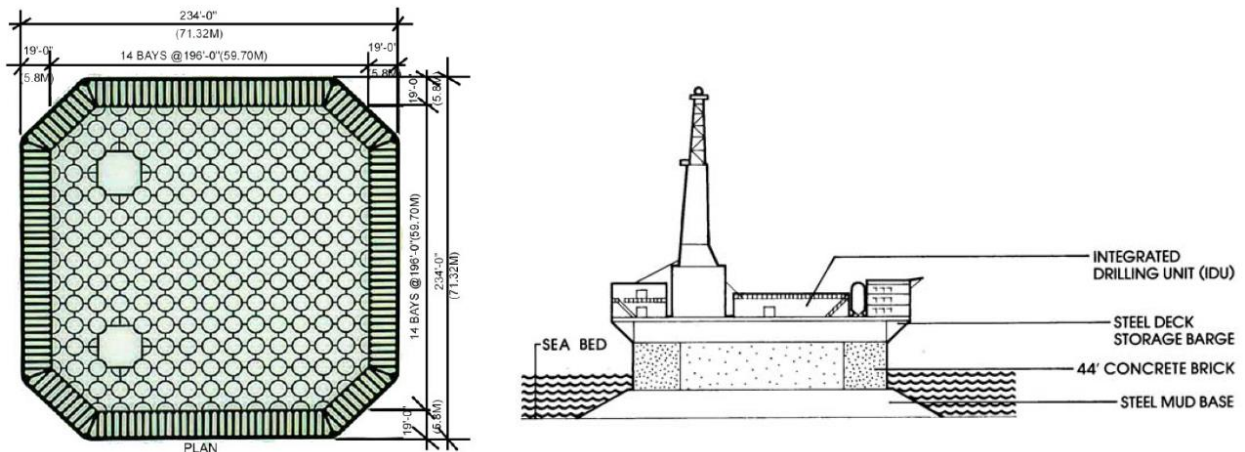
«Glomar Beaufort 1» Concrete Island Drilling System (CIDS)
